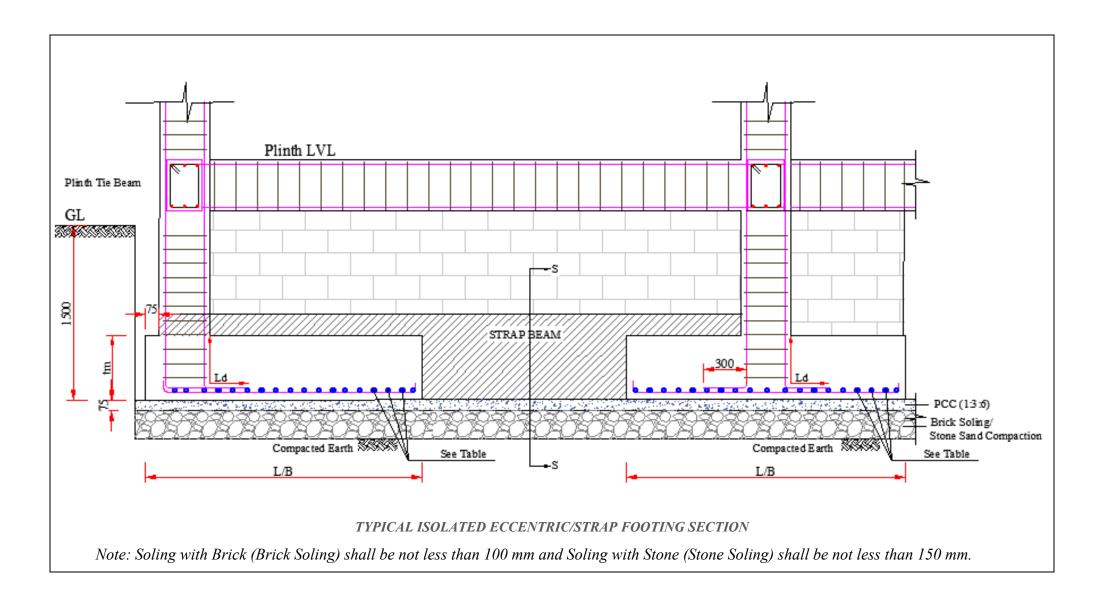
(A) TYPICAL ECCENTRIC FOOTING DETAIL
